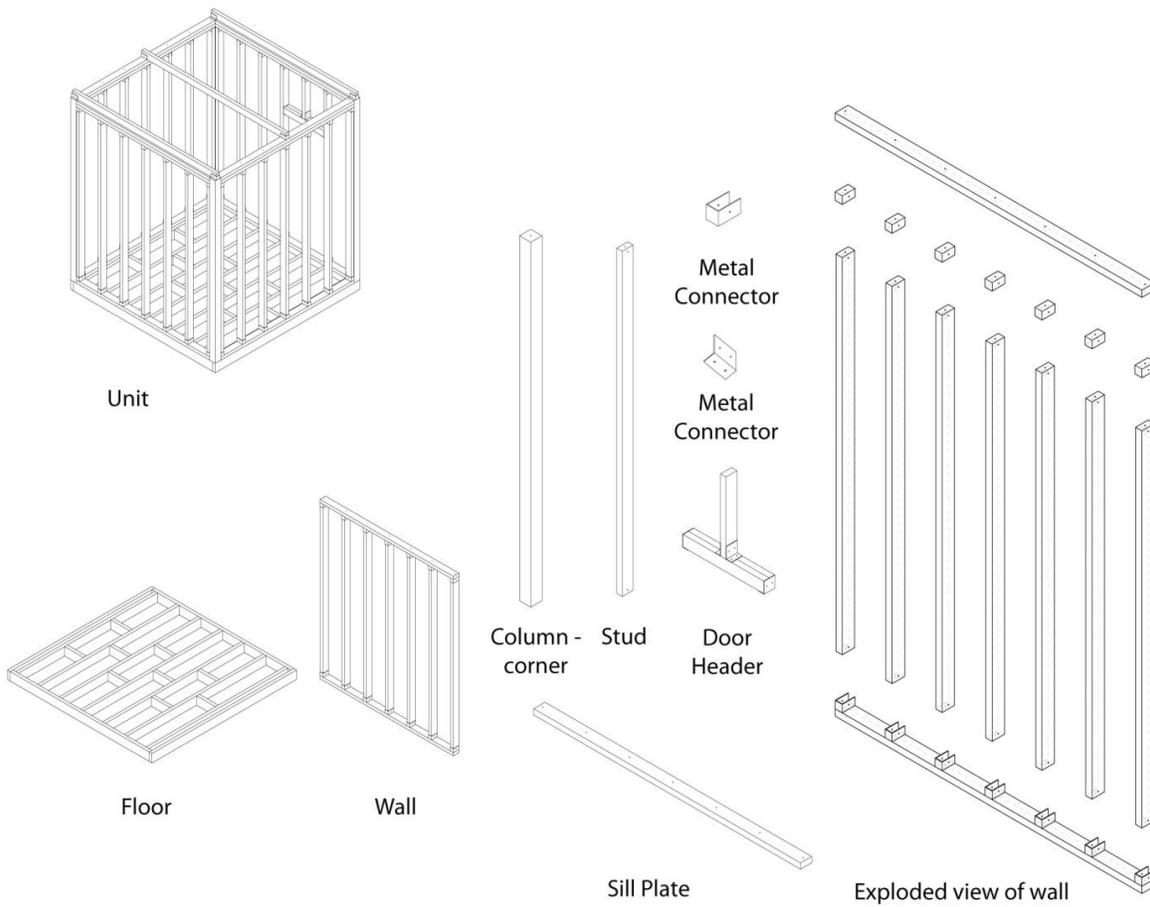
Pieces/components for assembly of units | using timber resources and metal components from suppliers
